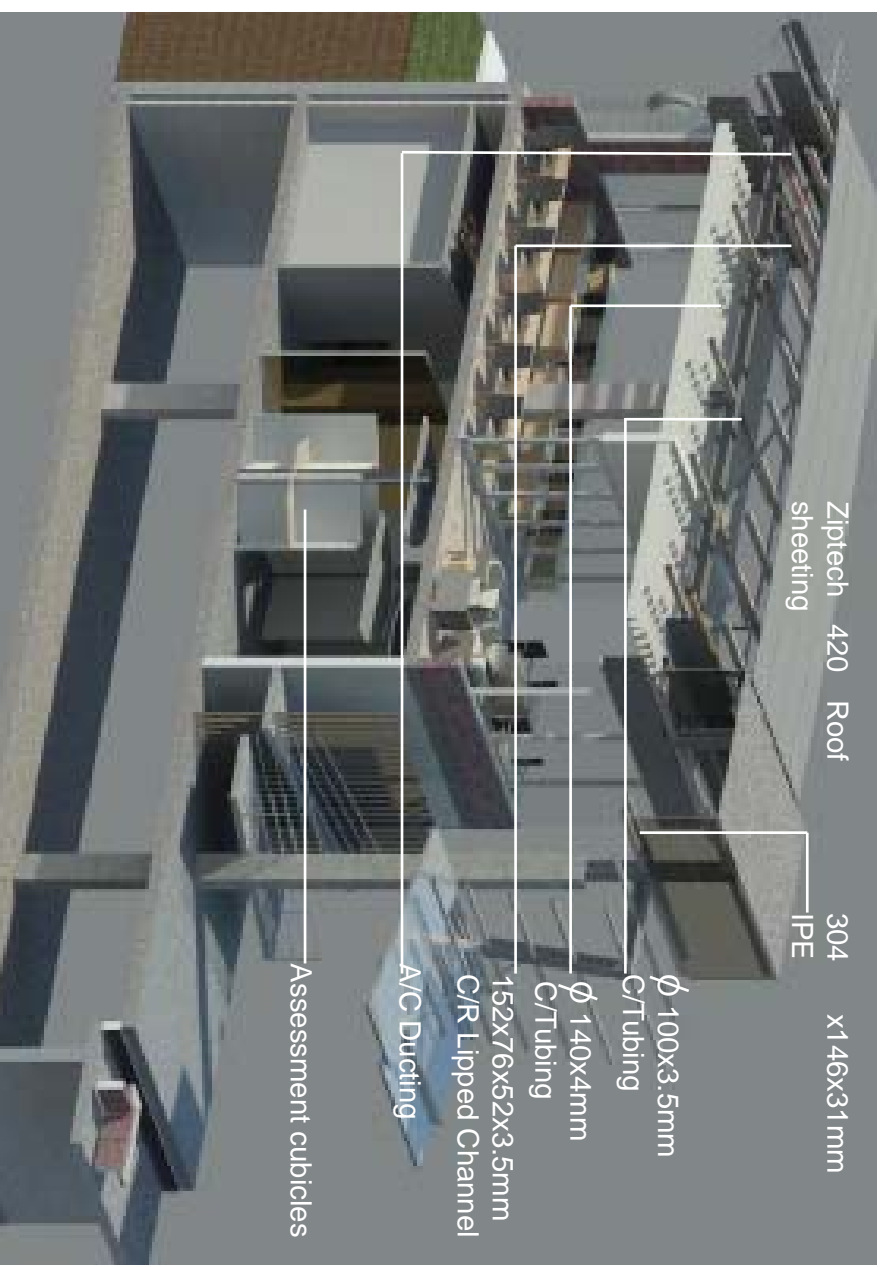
Exploded detail of lightweight steel roof construction
